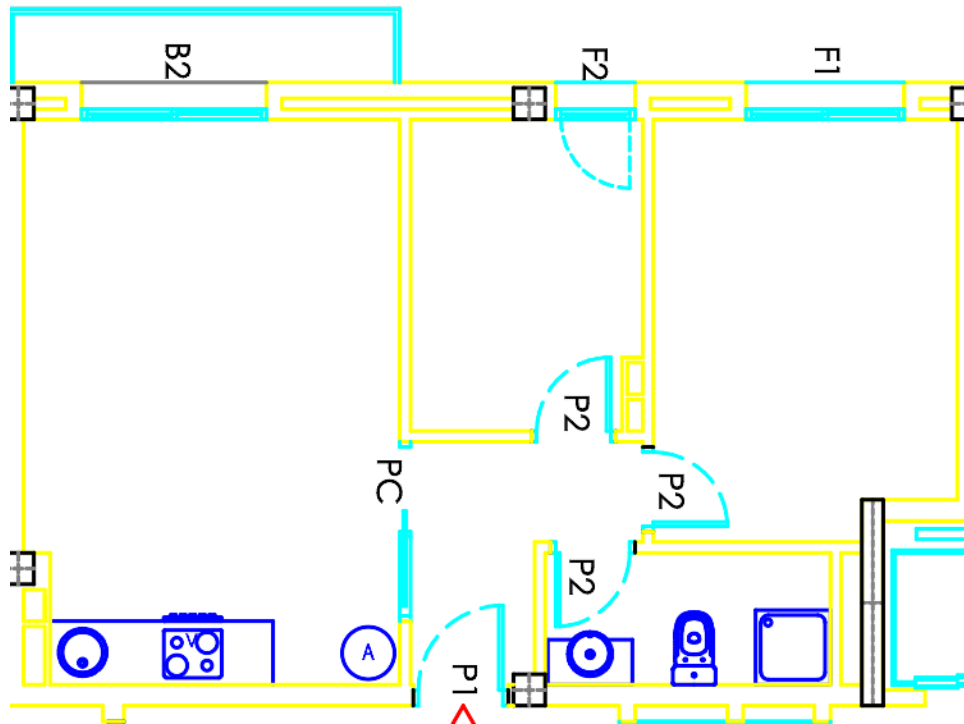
FLOOR PLAN OF THE APARTMENT 2 MENTIONED IN TABLE 2.19. TYPICAL TWO-BEDROOM APARTMENT OF THE TERRASSA DEMO SITE
